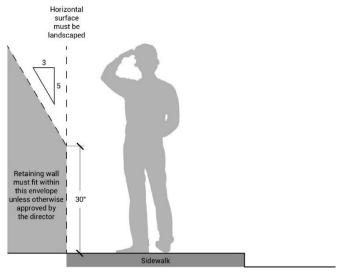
b. Allowed envelope for walls in street front setback.
